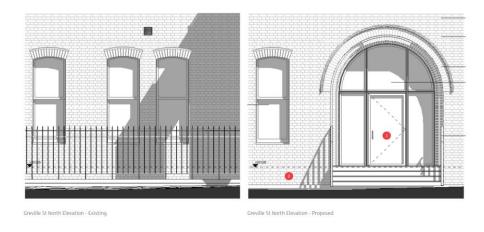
Existing (left) and proposed (right) view of new northern entrance.
